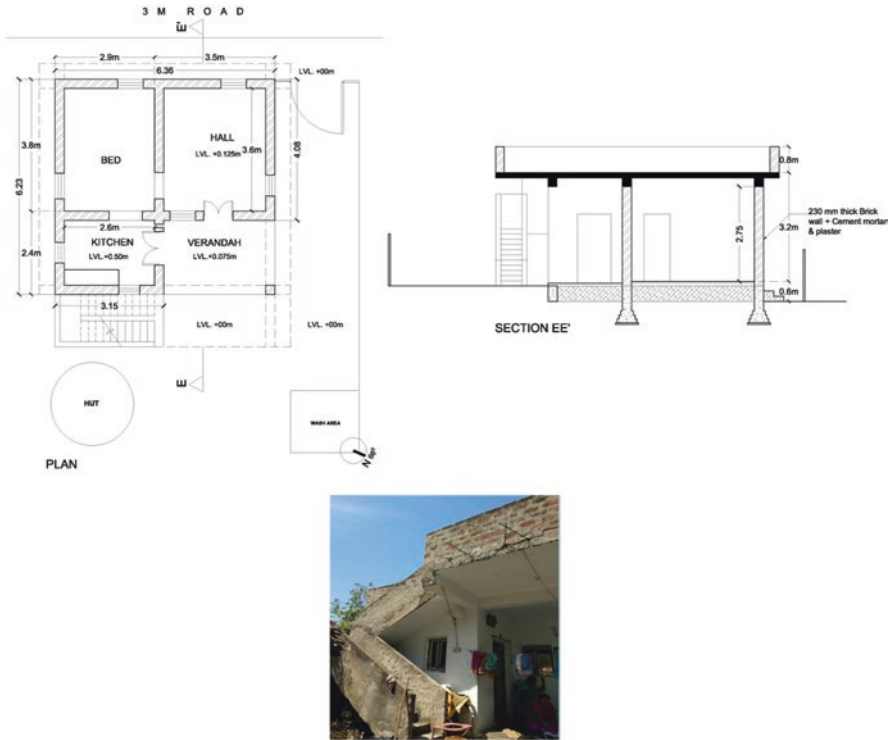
Floor plan, section, and image of House 5 made up of brick with cement-plastered walls and RCC slab
